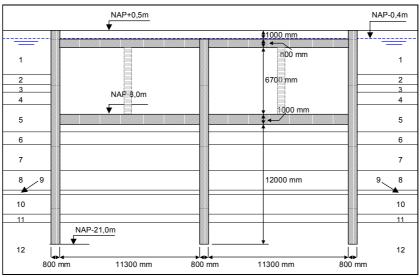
A section of the tunnel (adapted from Bruens (2003)).
